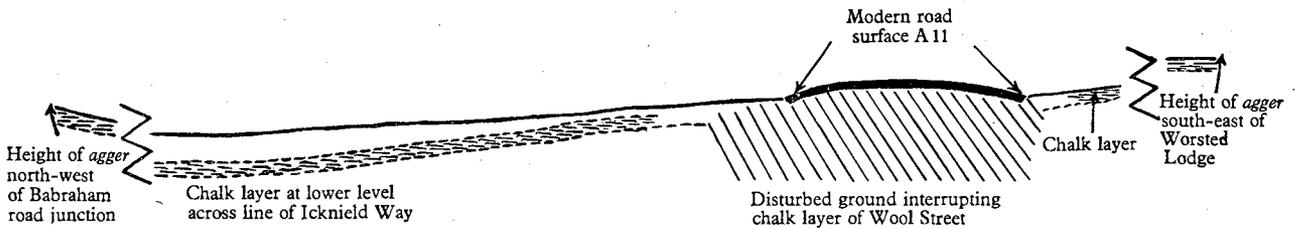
Longitudinal section along Wool Street crossing of Icknield Way and main A11 road, looking north-east. Horizontal scale: 1 in. = 16 ft.; vertical scale: 1 in. = 8 ft.
